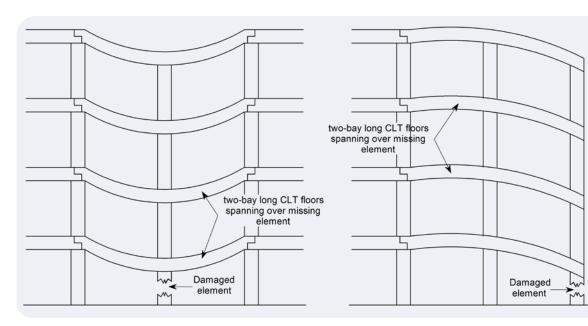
Two-bay long CLT floors creating an alternative load path for mass timber buildings.
